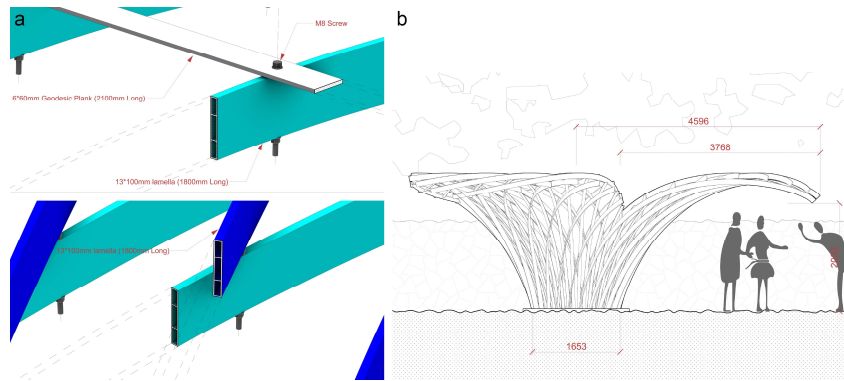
a) construction details: joints; b) elevation (unit: millimetre) [1].
